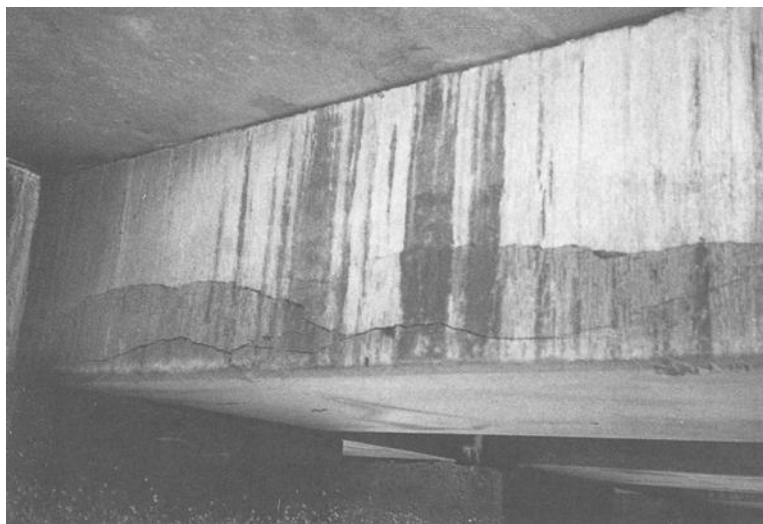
Example of typical damage to lower corner of reinforced concrete beams. Note cracking.
